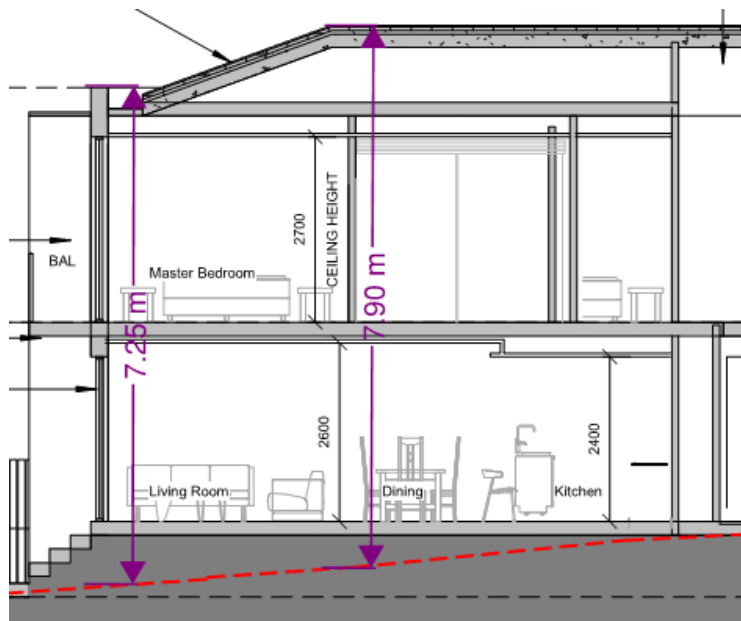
Extract of the architectural plans showing the maximum proposed building height of 7.9m at a determined point
